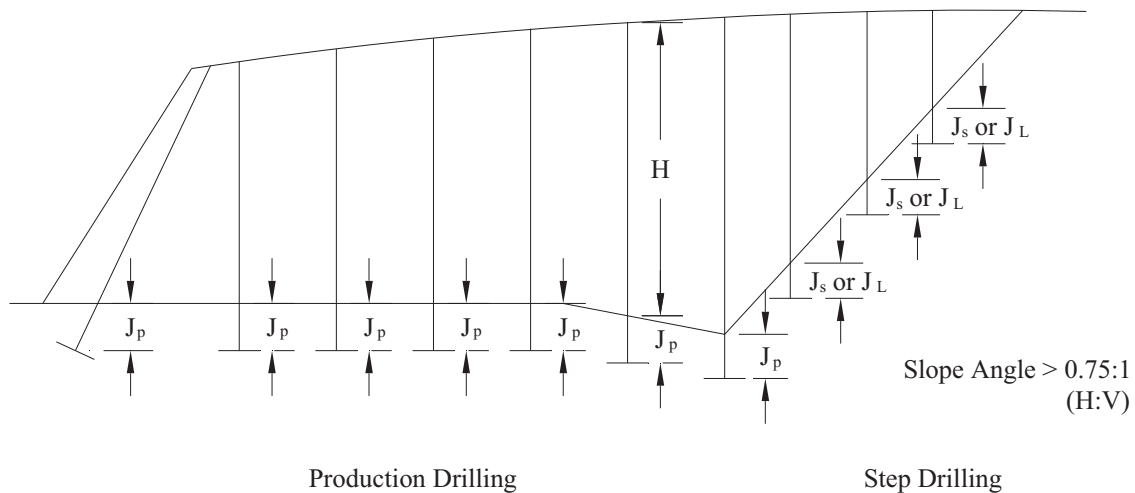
Illustration. Cross section of downhole and step drilling with sub-drilling techniques (modified from Cummings 2002).
